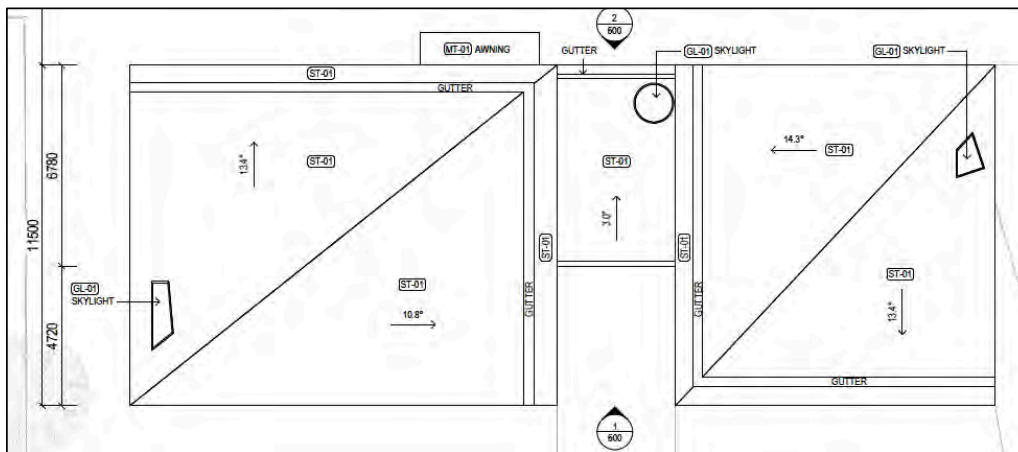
Proposed Roof Plan showing cladding, gutter arrangements and angle of roof structure.
